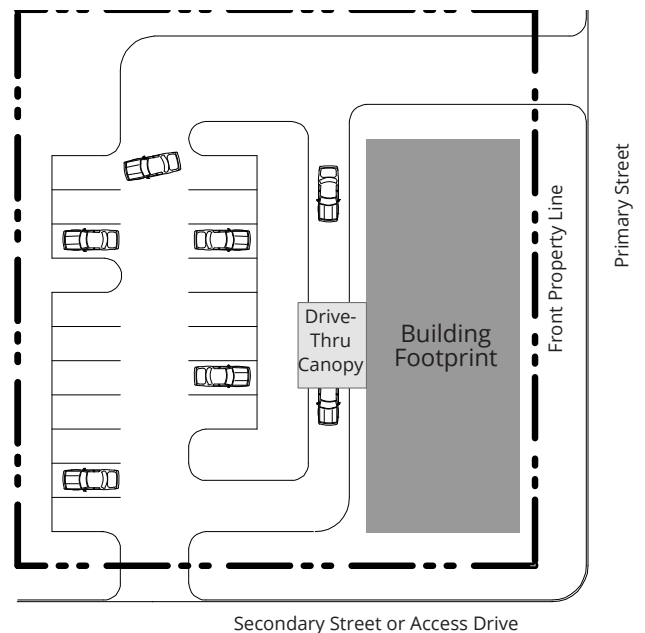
(6). Recommended Drive-Through Facility Layout.
